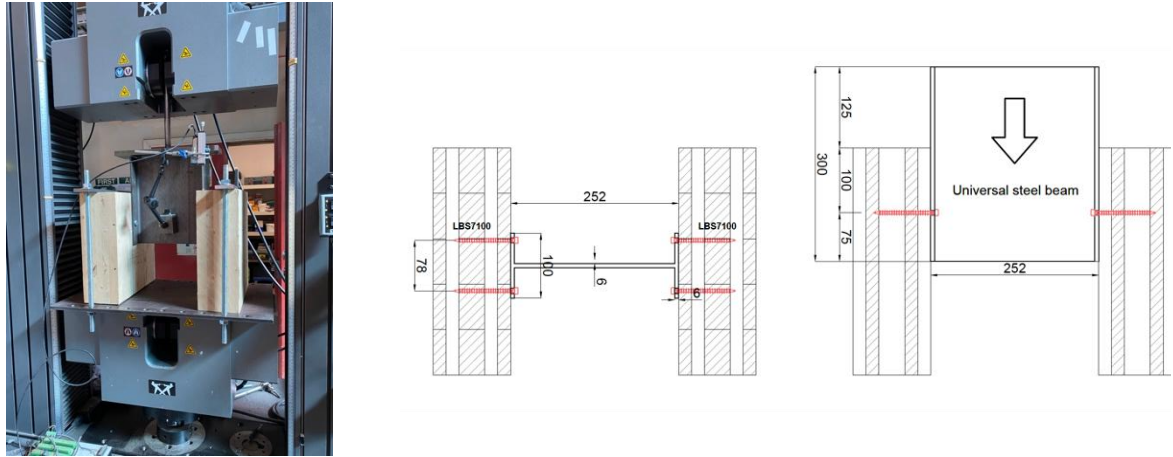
Geometry, cross-section, and details of in push-out test on HBSP12120
